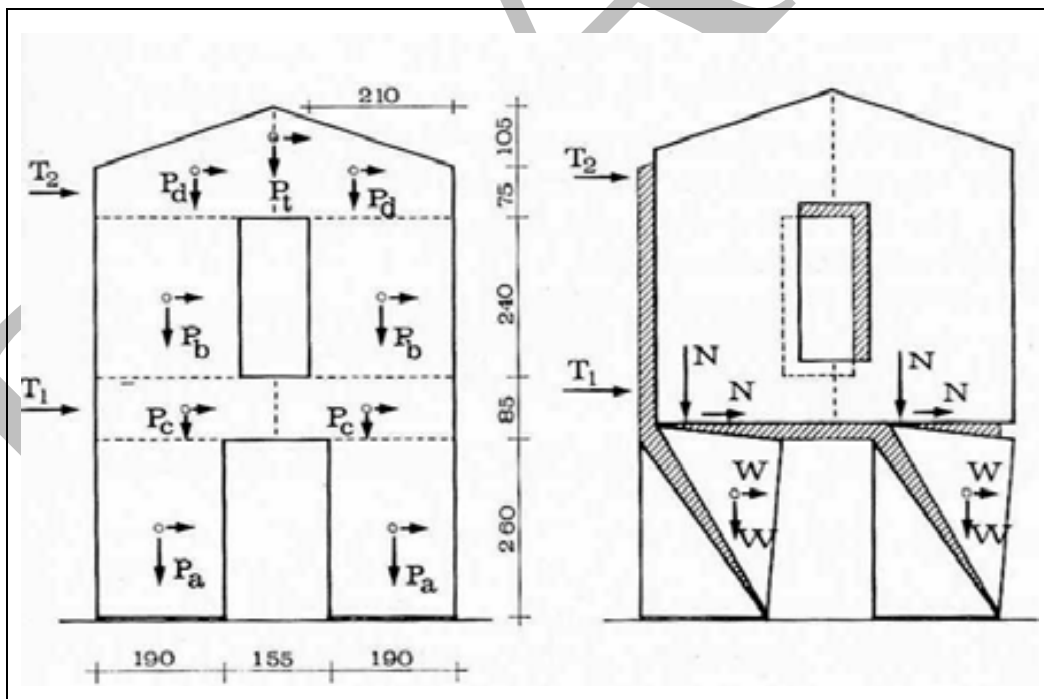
Identification of macro block on a masonry building façade (Giuffrè 1991).
